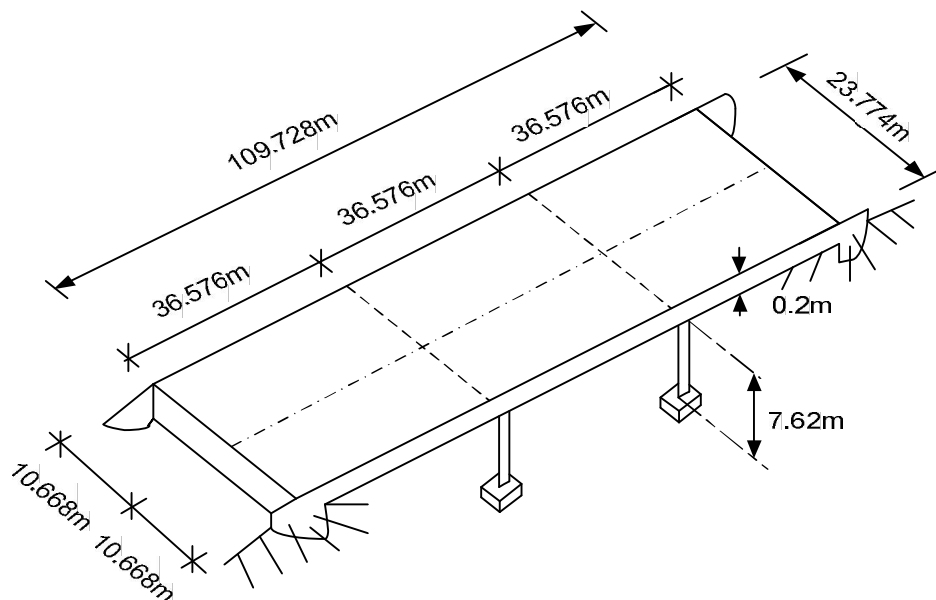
Dimensions of a Three Span Deck Girder Bridge
